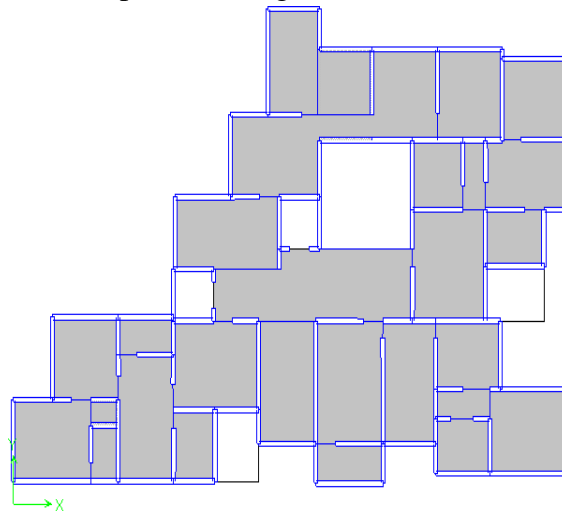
3D Model of G+13 Storied RC Structural Wall
